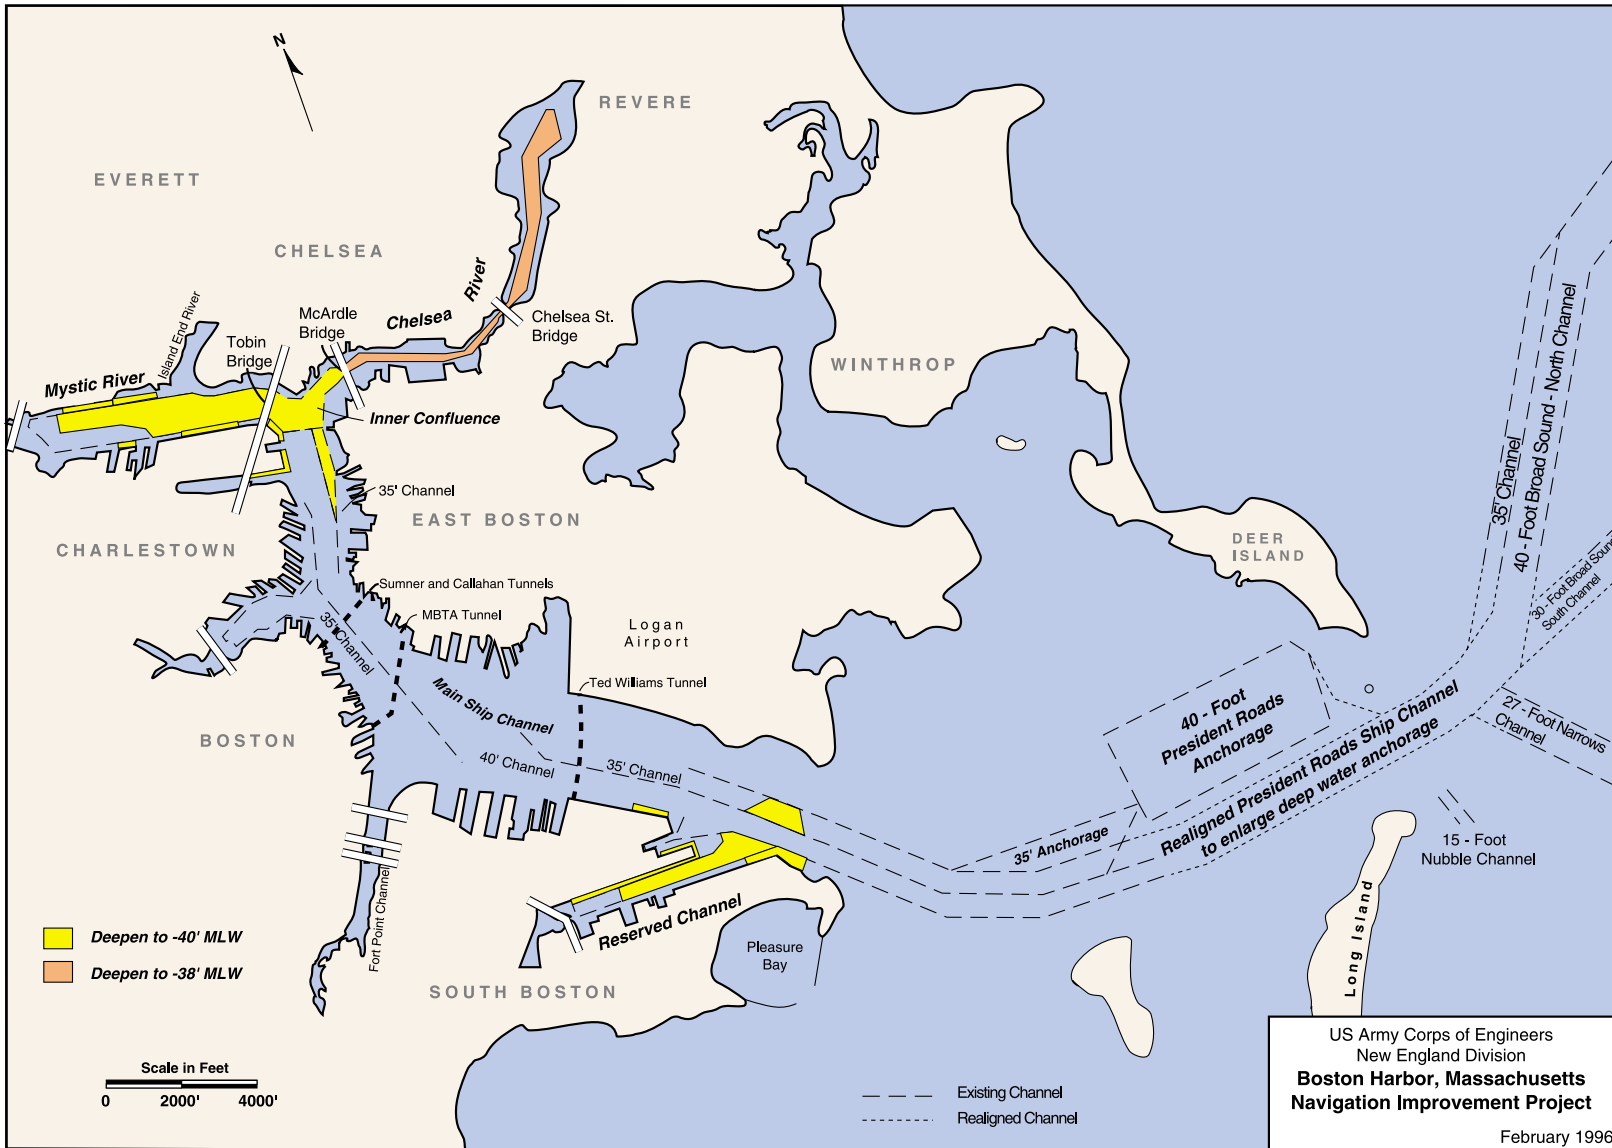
BHNIP Dredging Plan Source: U.S. Army Corps of Engineers, New England District
